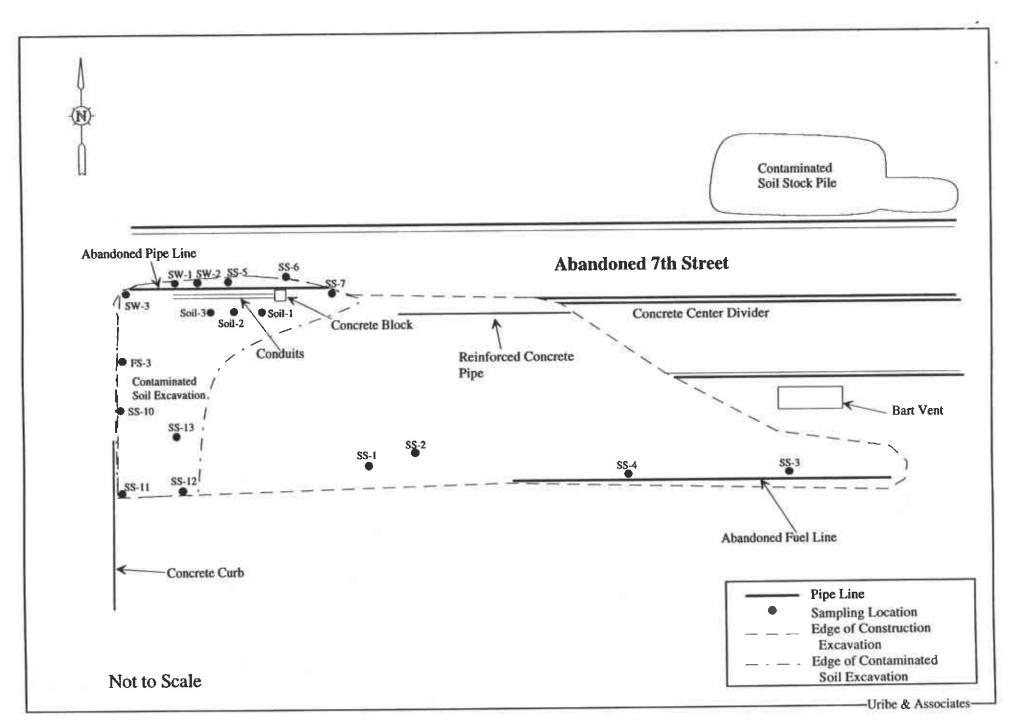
Site Plan with Sampling Locations and Extent of Excavation
